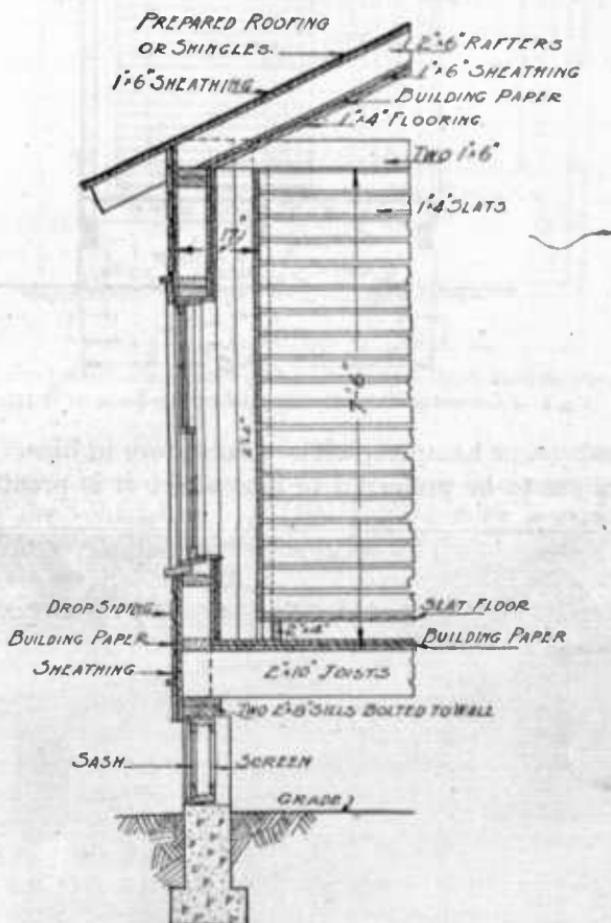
Details of construction of sweet-potato houses of the types shown in figures 1 to 3, 5, and 7 to 9.
